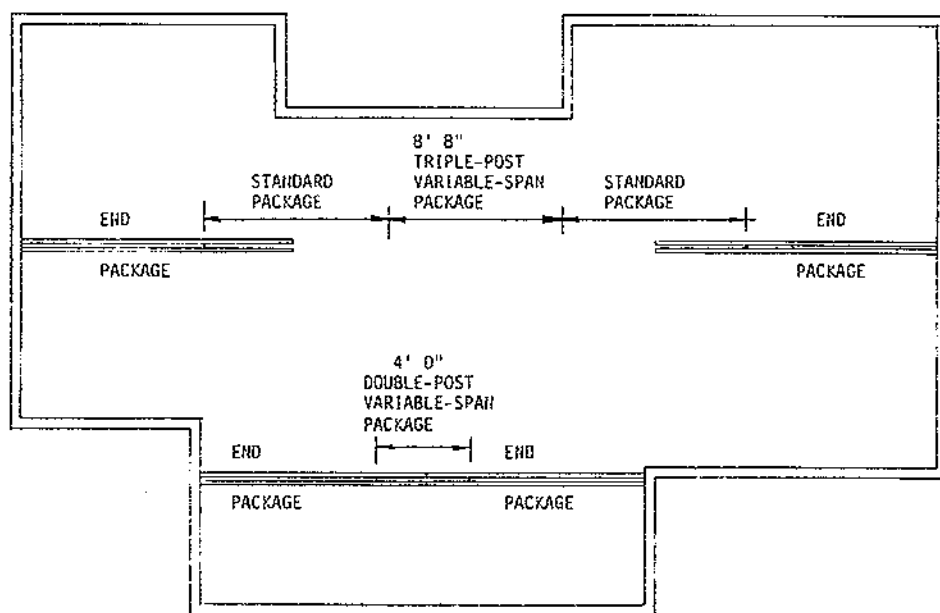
End-span packages fitted to foundation panels to begin center-beam construction.
